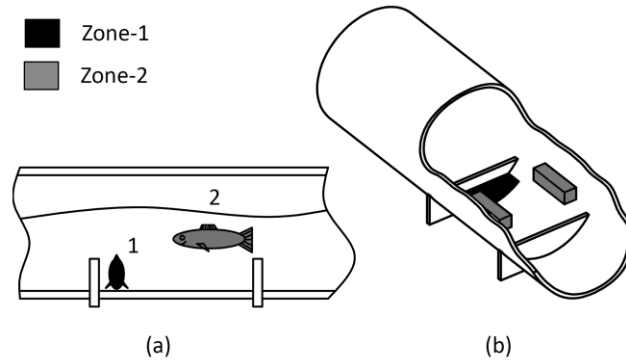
Illustrations of fish zones in the baffled culvert (a) elevation; (b) perspective
